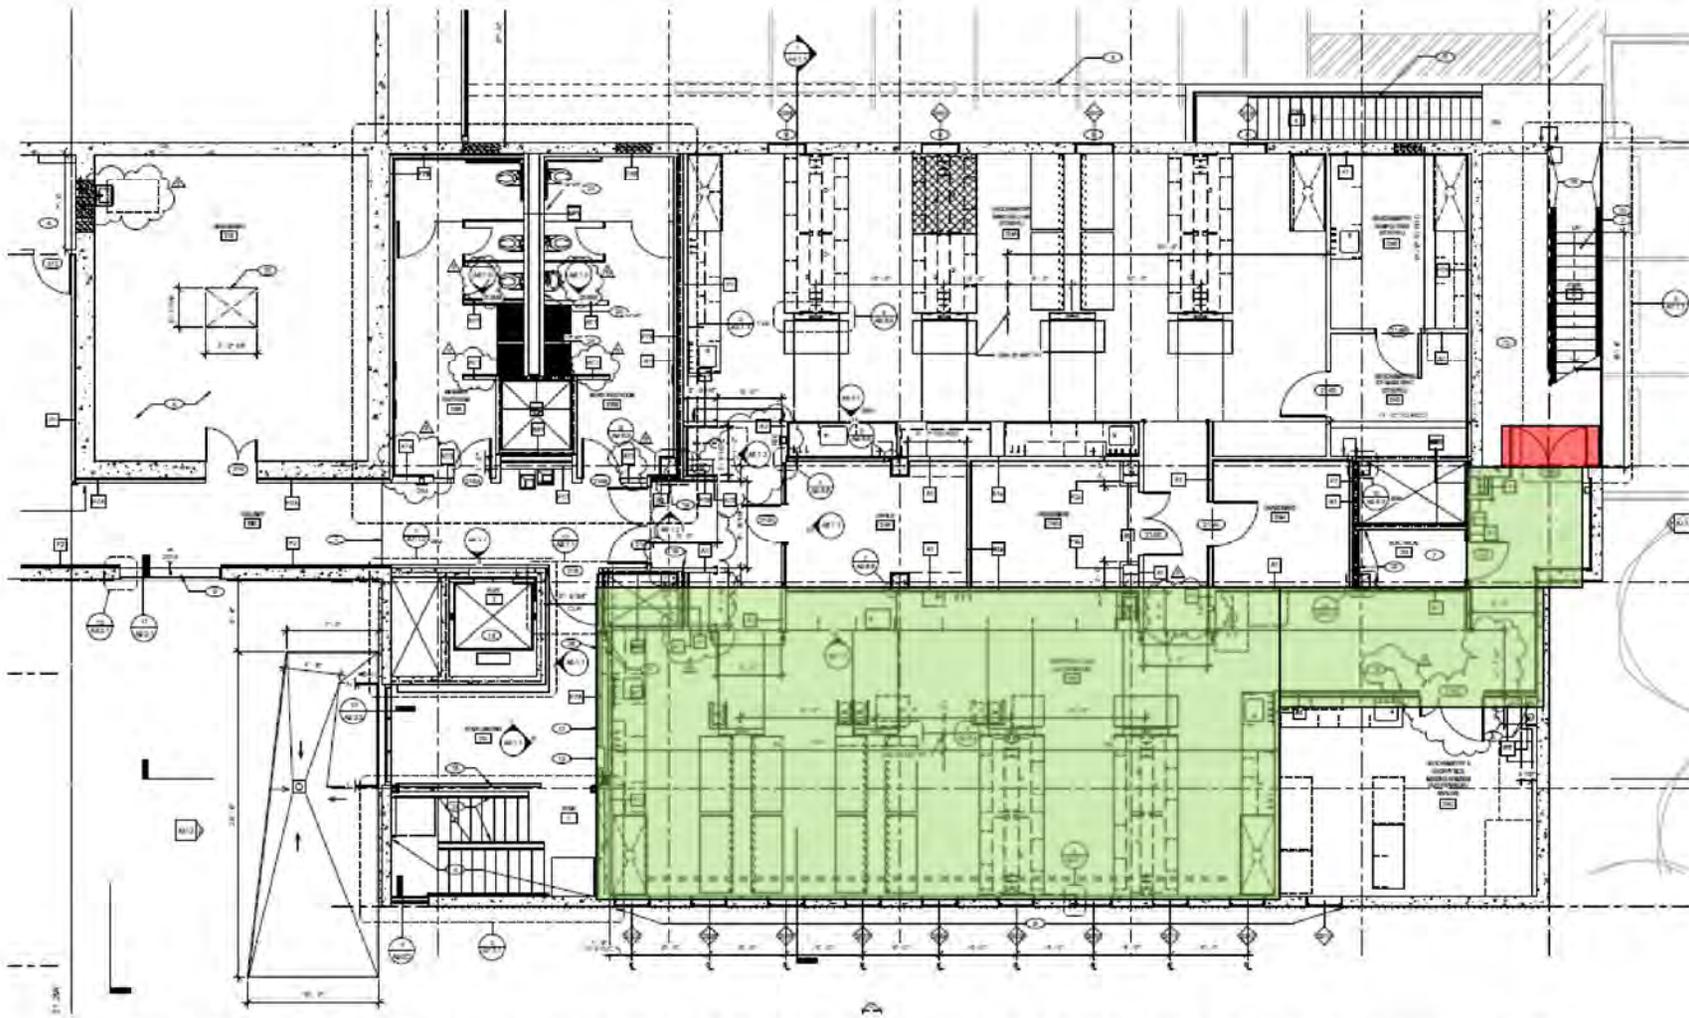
Second Floor East layout, room 214A and B with combined opening at East end (red) to exterior for pressure relief in smoke mode
